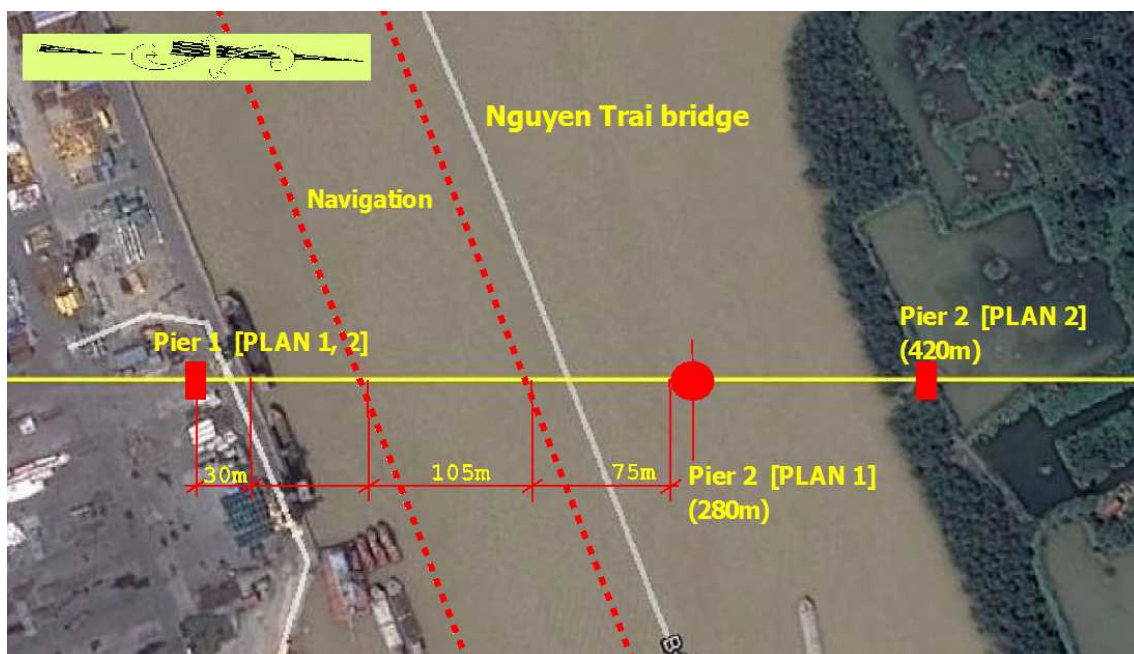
Available Area for Substructure Construction and Main Span Length
